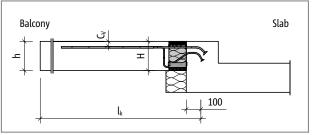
Schöck Isokorb® XT type K-O: Static system
